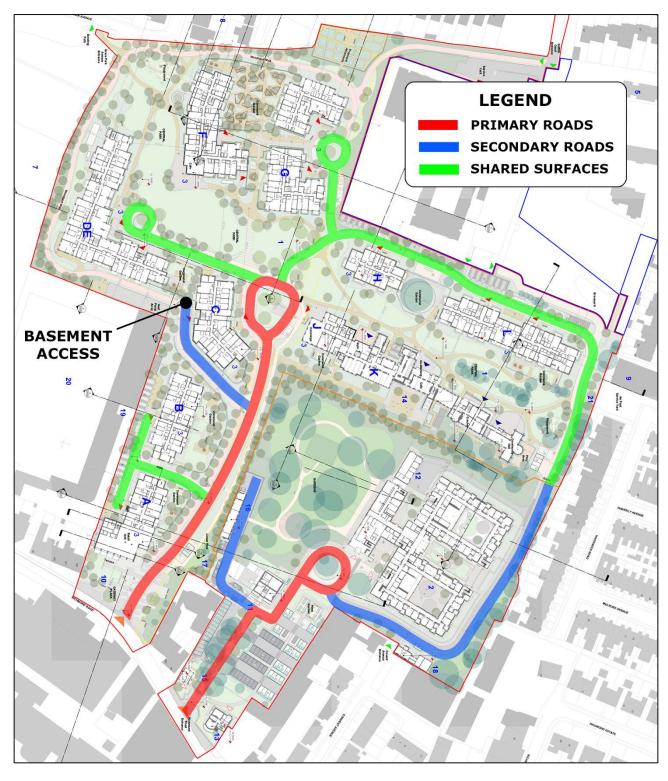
Proposed Site Plan (SVRD-STW-ST-00-DR-A-022003 Proposed Site Plan - Level 00)
